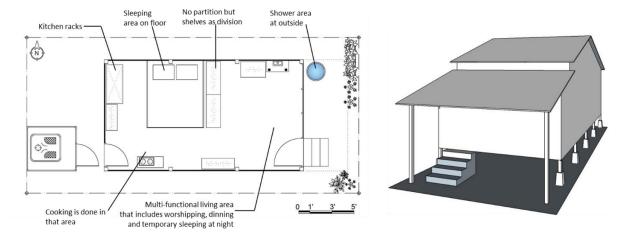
Initial housing layout and design of Site 1 and Site 2
